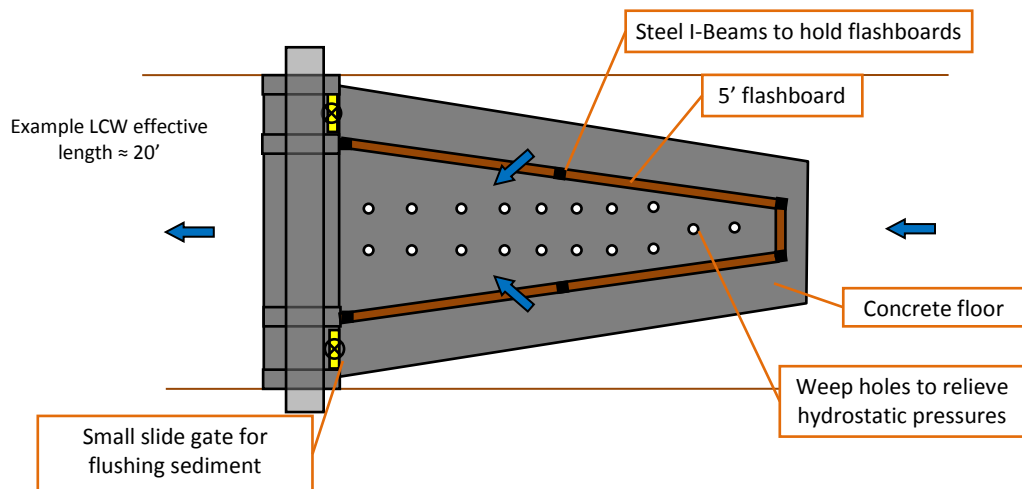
Example of new LCW structures to be constructed along the Mission F Canal (not to scale)
